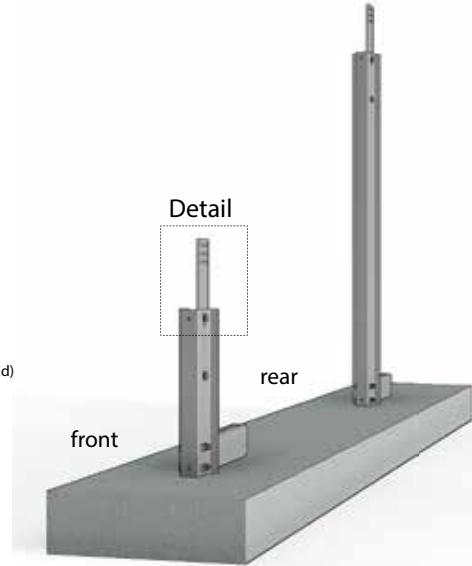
3 (front view, foundation rails with steel heads)
